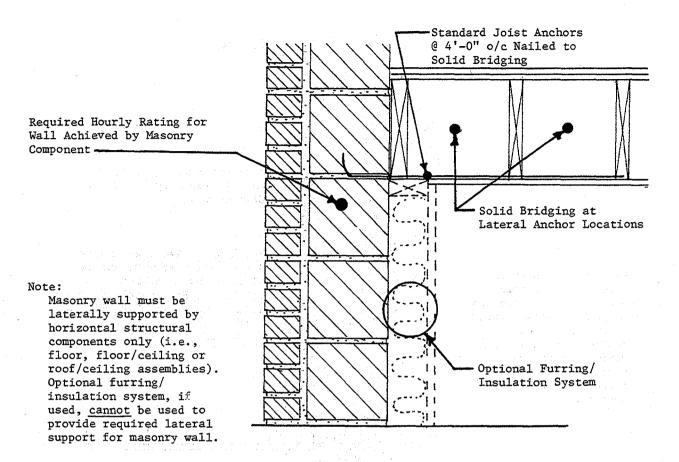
Multi-Wythe Masonry Wall (Non-Bearing Condition) Note:
